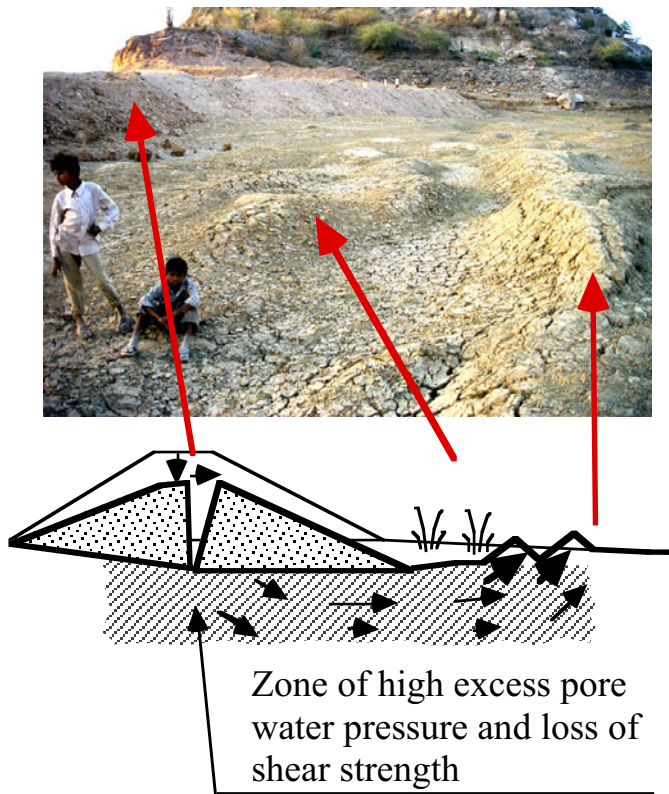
Failure of road embankment at Chiebunnai Bridge in 1994
